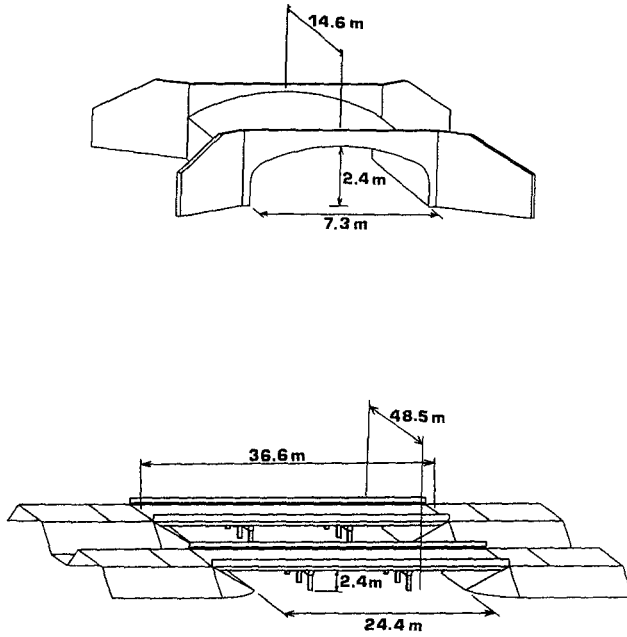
Precast concrete wildlife crossing on SR 29 (top) and bridge-style wildlife crossing (bottom) on I-75 in Collier County, Florida.
